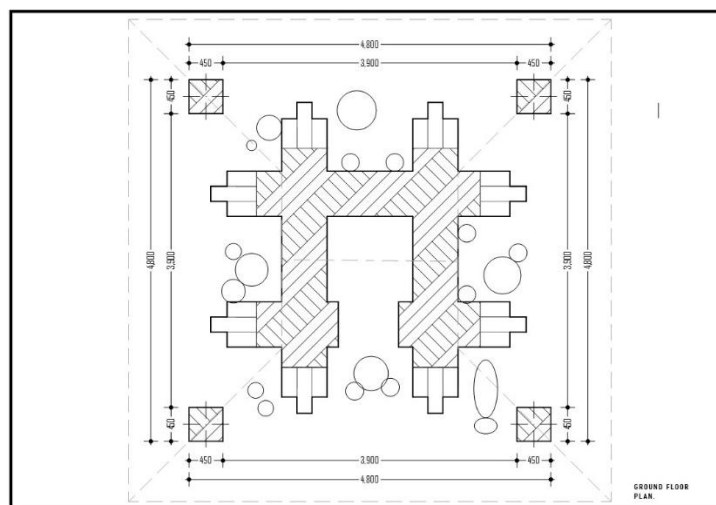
Sketch of Floor Plan at Mbari House at Umunakara
